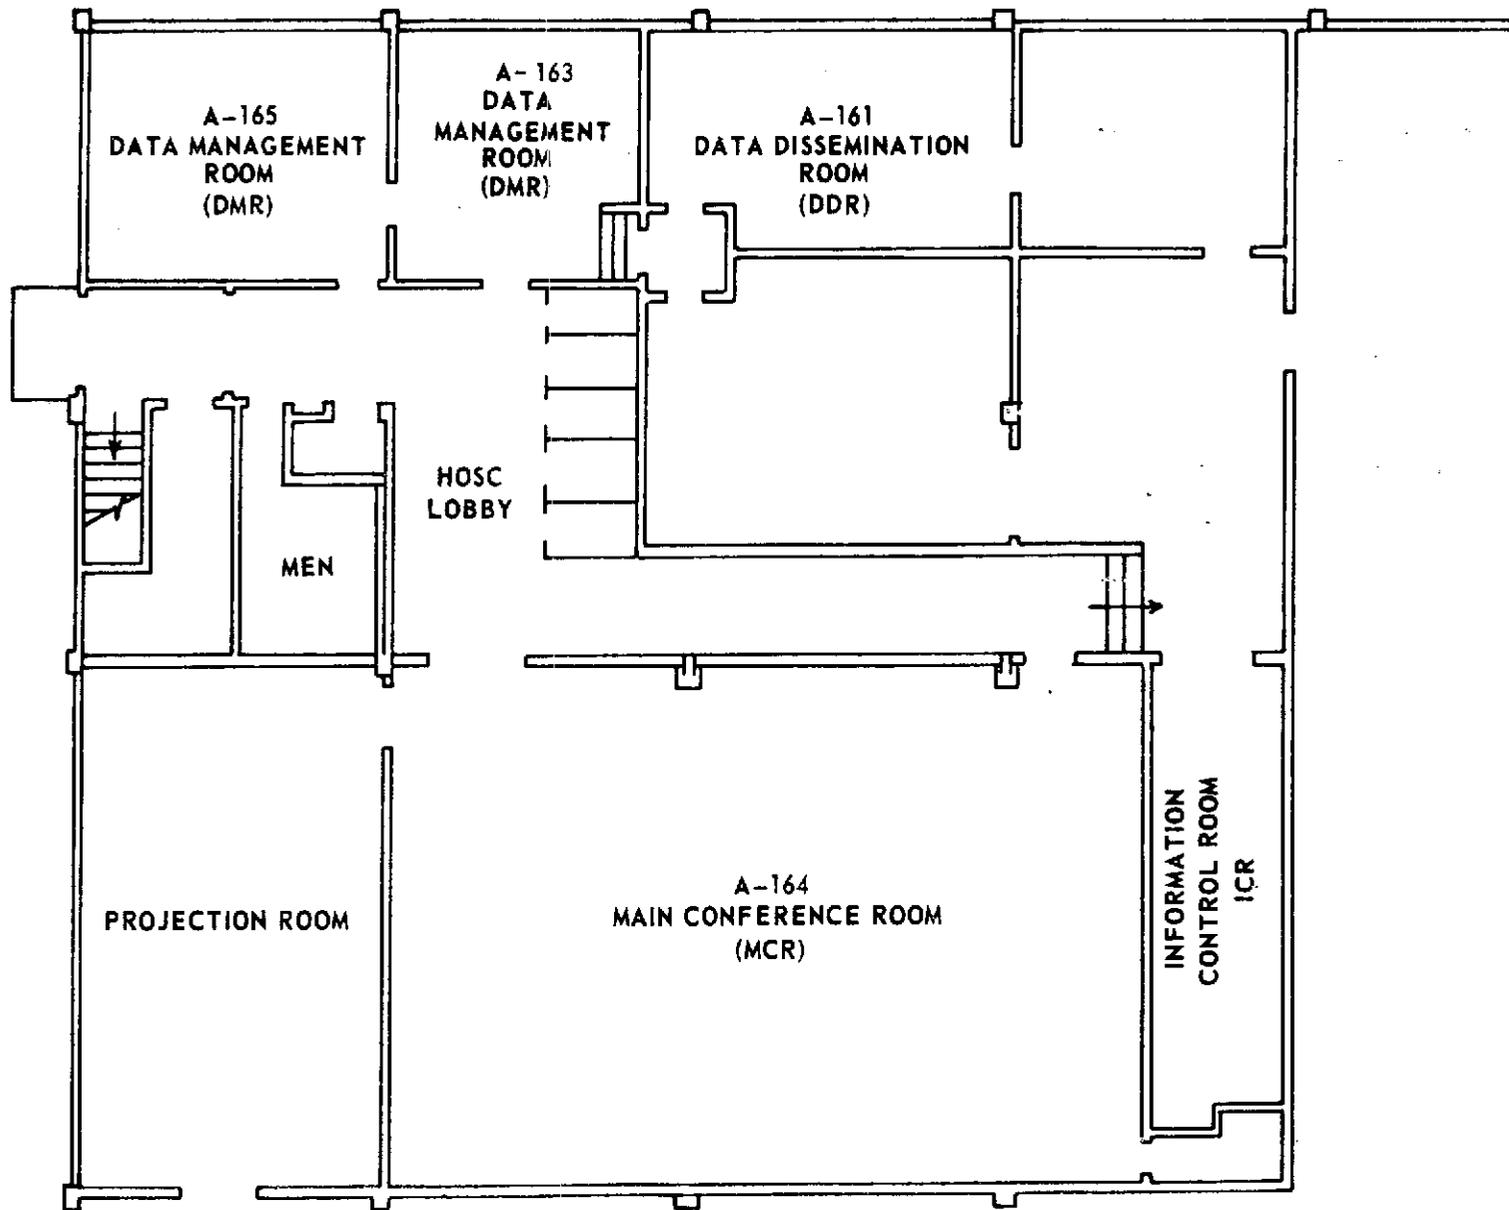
HOSC FLOOR PLAN (FIRST FLOOR)
